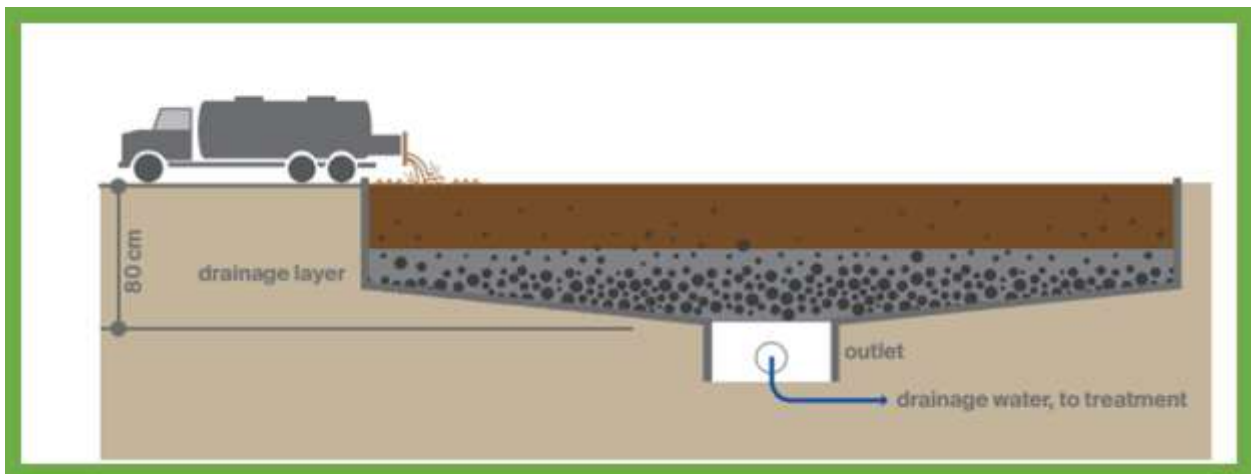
Section view of an Unplanted Sludge Drying Bed (Tilley, et al., 2014)
